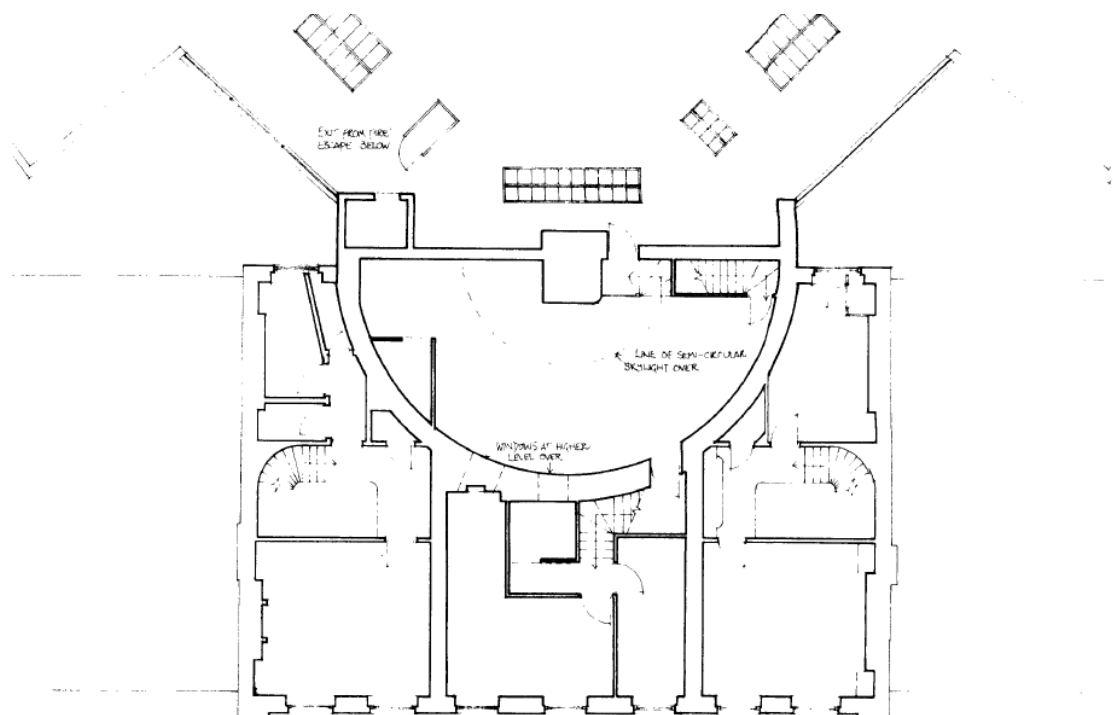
Existing second floor plan, 1994. Camden planning ref: HB/9370268.
